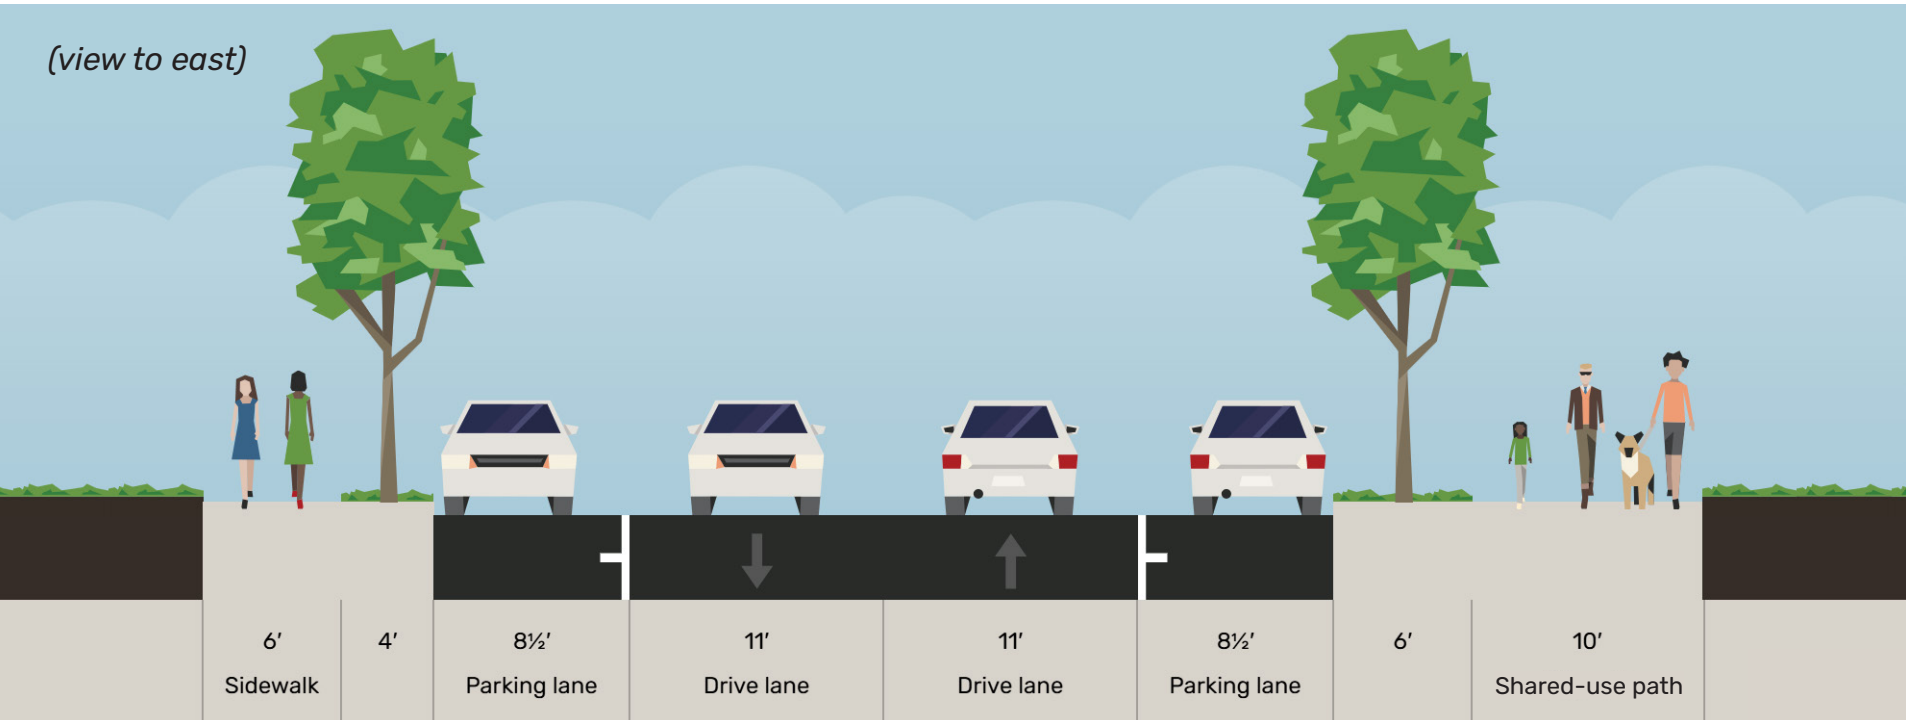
Proposed Typical Cross-Section on Creekside Drive (65’ ROW)
